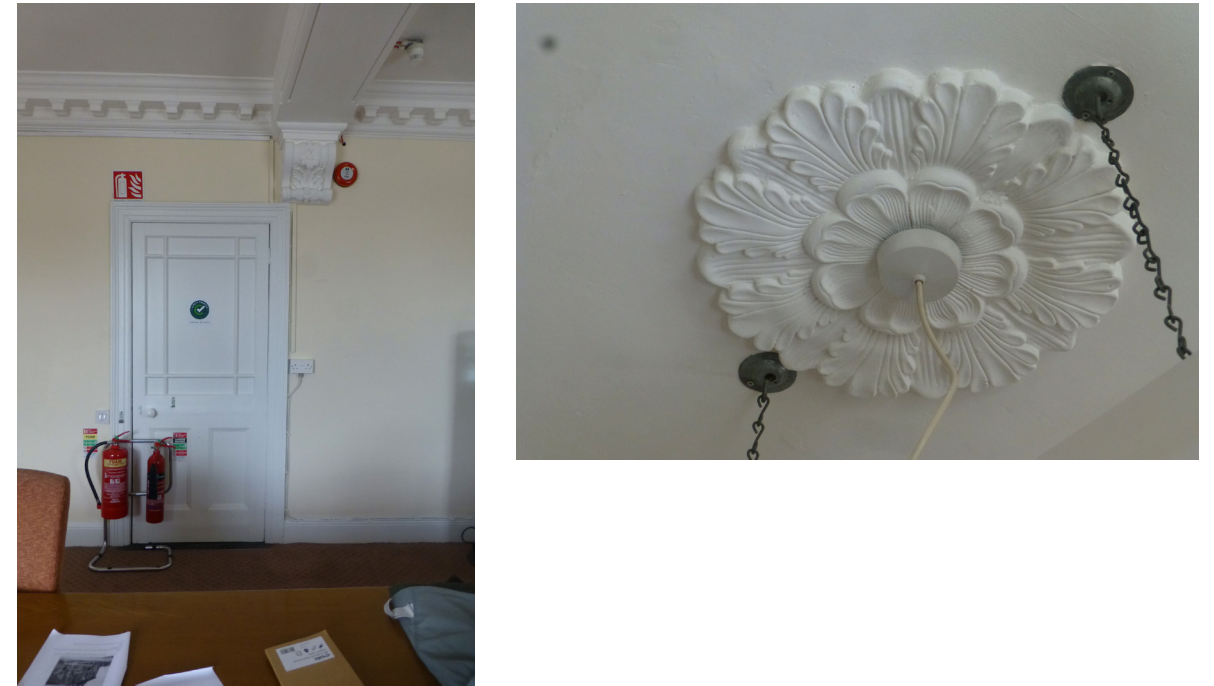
(a-b) Plaster detailing decoration from the 1925 reconstruction.
